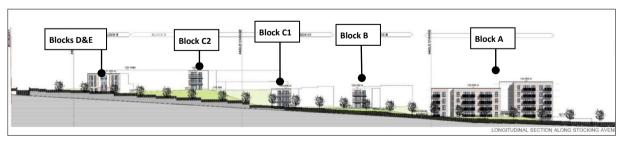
Contiguous Site Section, Stocking Avenue, [Source: RAU Drawing No. P1-153D]
